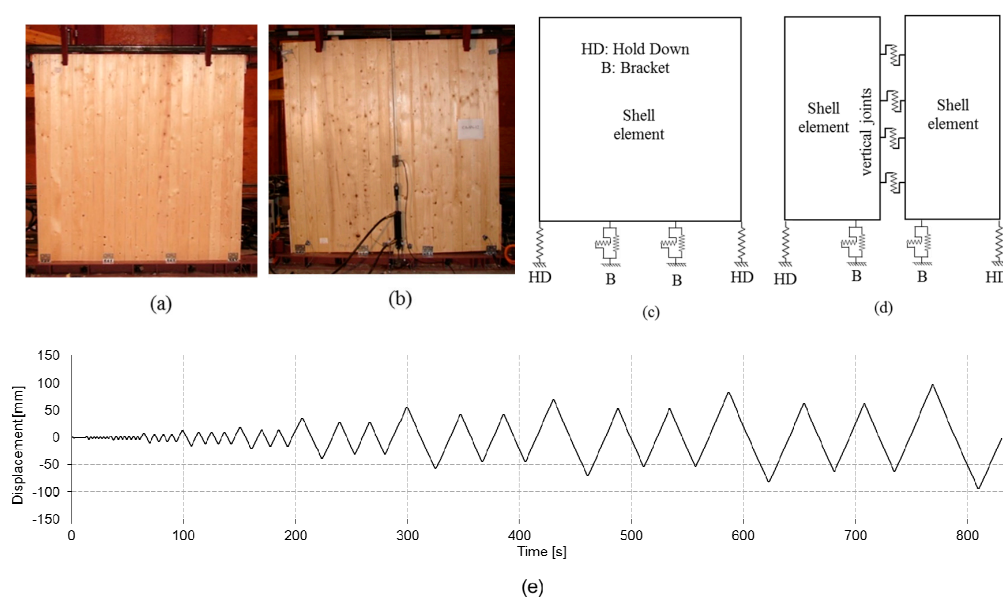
CLT shear wall's test setup ((a) single wall and (b) coupled wall); schematic of FE models ((c) single wall and (d) coupled wall); and, (e) CUREE loading [28].
